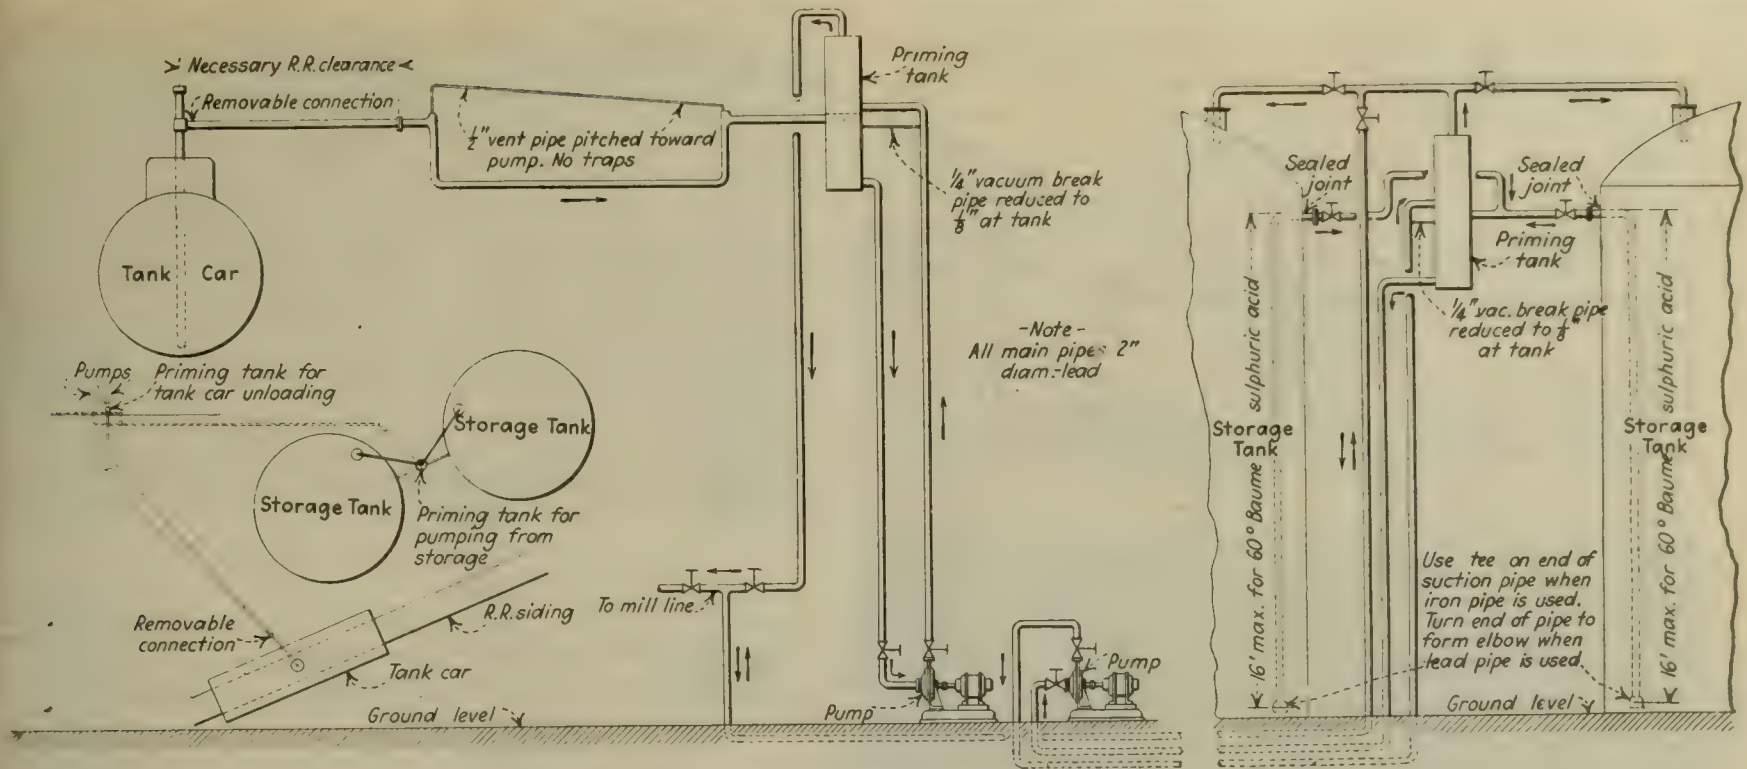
PLAN AND ELEVATION OF ACID-HANDLING CONNECTIONS
